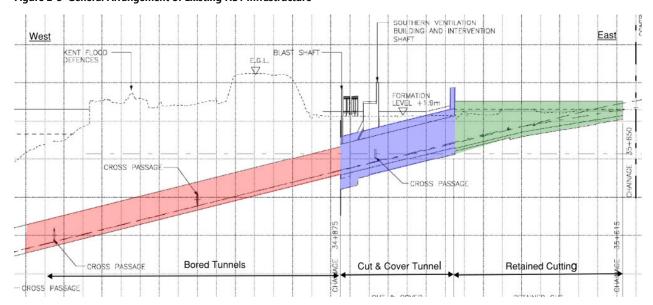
General Arrangement of Existing HS1 Infrastructure
